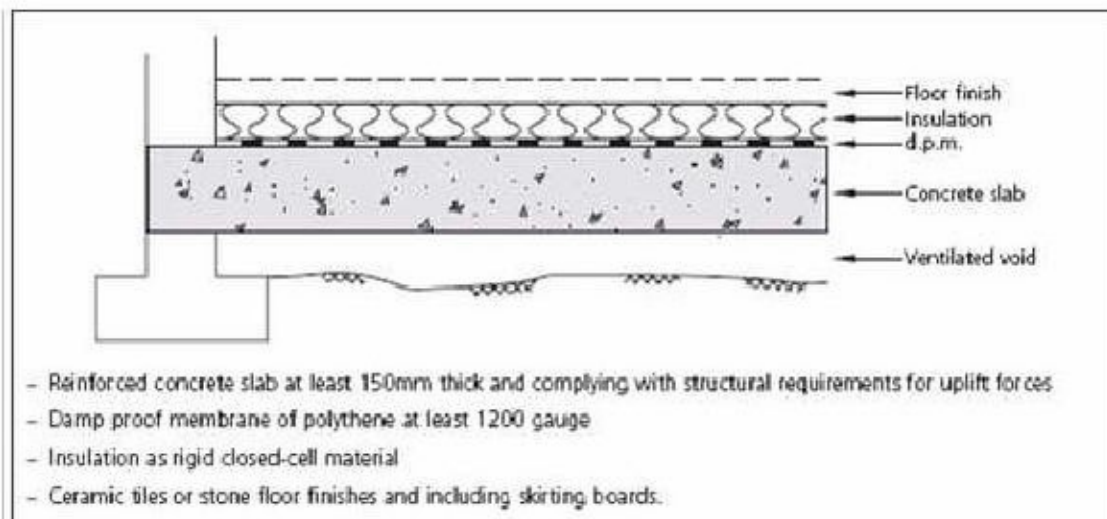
Suspended Concrete Floor (Source: DCLG, 2007)
